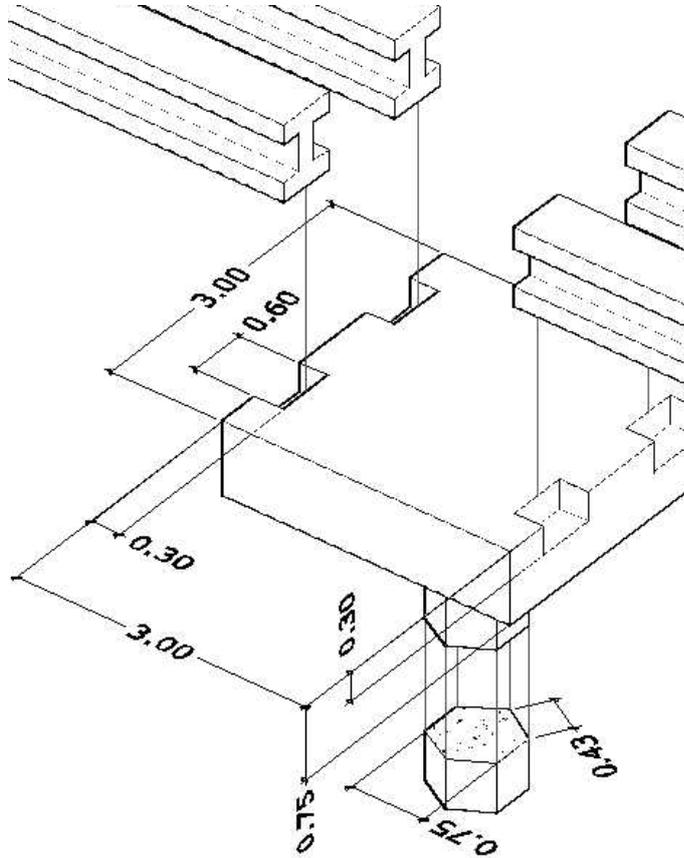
Four girders that supported on the column of Problem 9.4-4.
